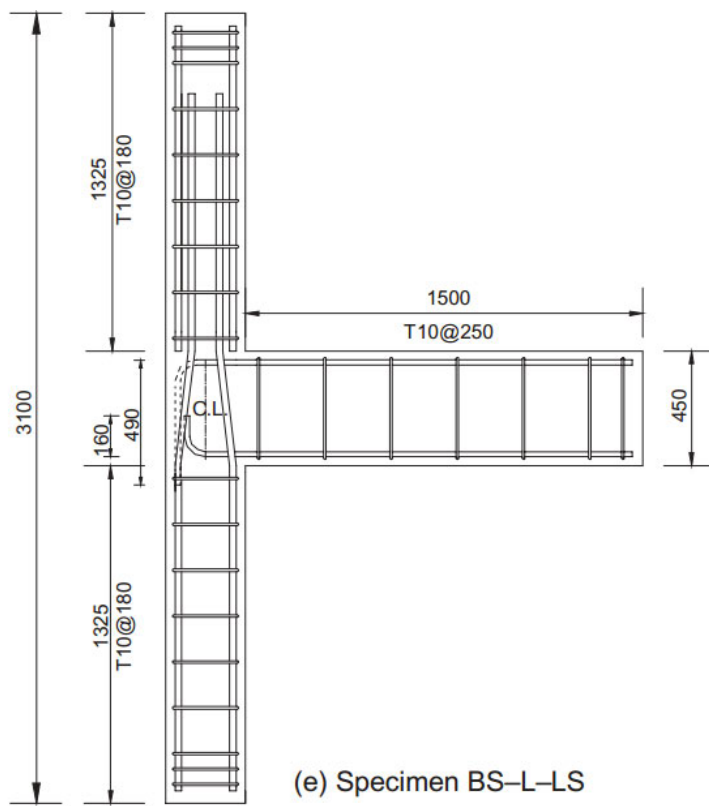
Test units BS-L-LS: dimensions and reinforcement details (Kuang and Wong, 2005)
